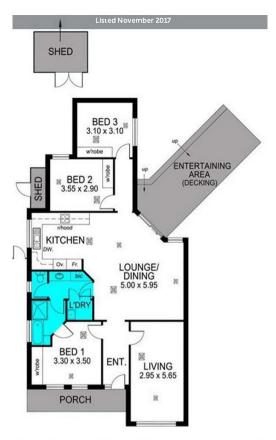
Floor Plan of 39A Barwell Avenue, Marleston as at November 2017 (Source: realestate.com.au)
